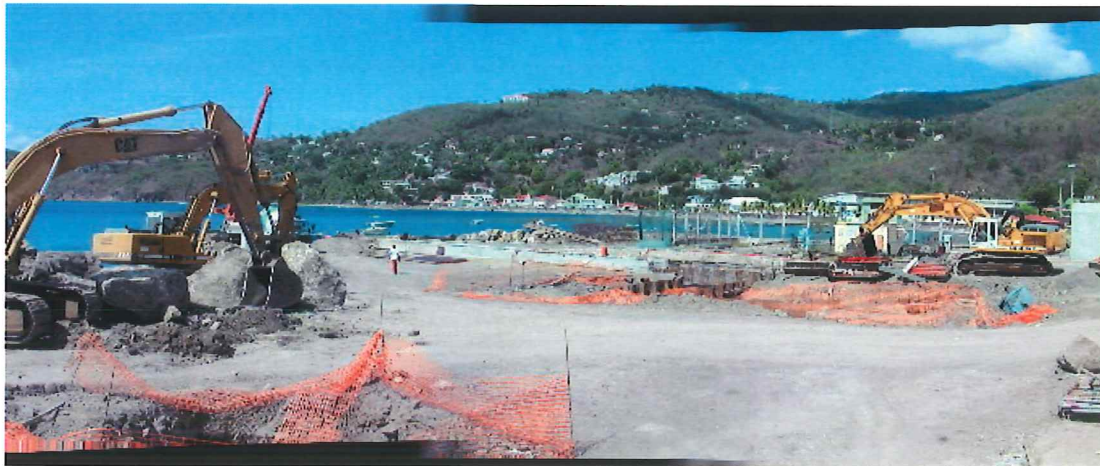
Site of well BO-3 where the construction of the seawater pump station is under way. The photograph is taken March 14th. The test pit in the lower left corner had a temperature of 70°C.
